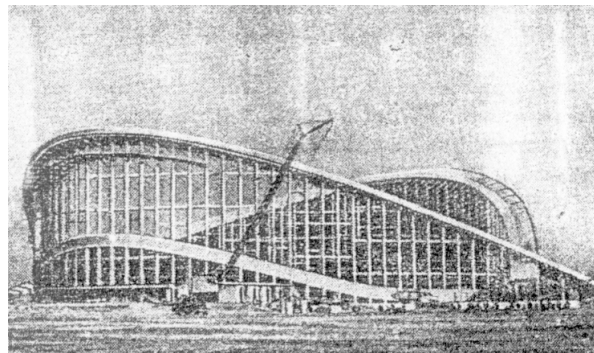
Saddle-shaped roof of the Raleigh Arena, USA.
